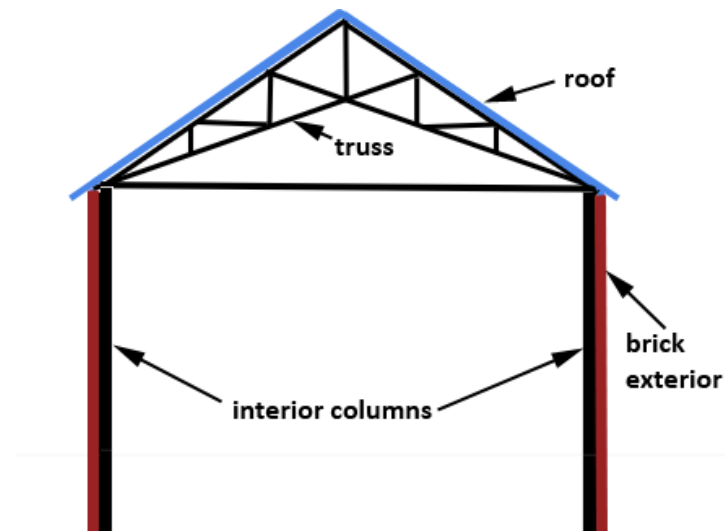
Proposed new steel frame and roof scissor truss to support a new roof in the absence of a second floor. Black portions are steel sections, several of them placed along the length of the building.
